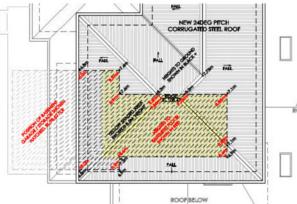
Roof plan showing building height notations (maximum 8.3m from ground level, maximum 9.86m where measured from basement floor level
